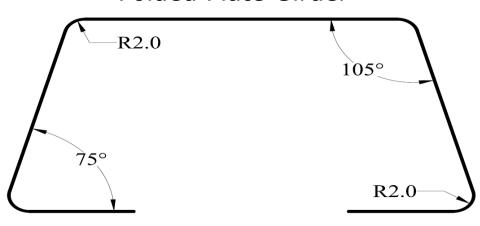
Typical cross section for the Folded Plate Bridge System. Dimensions vary based on span length.
